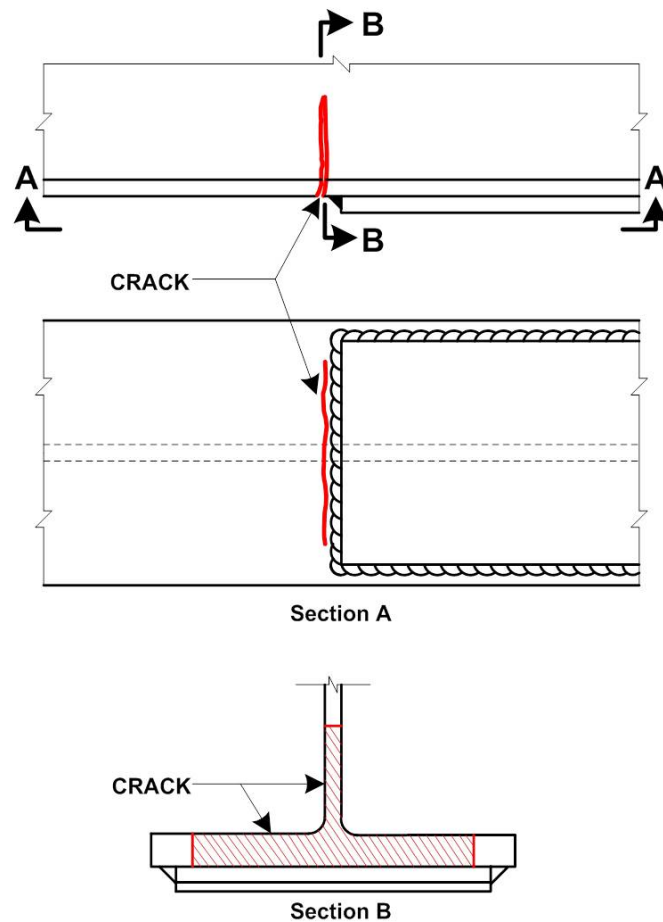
Crack at end of cover plate propagating through the flange and into the web.
